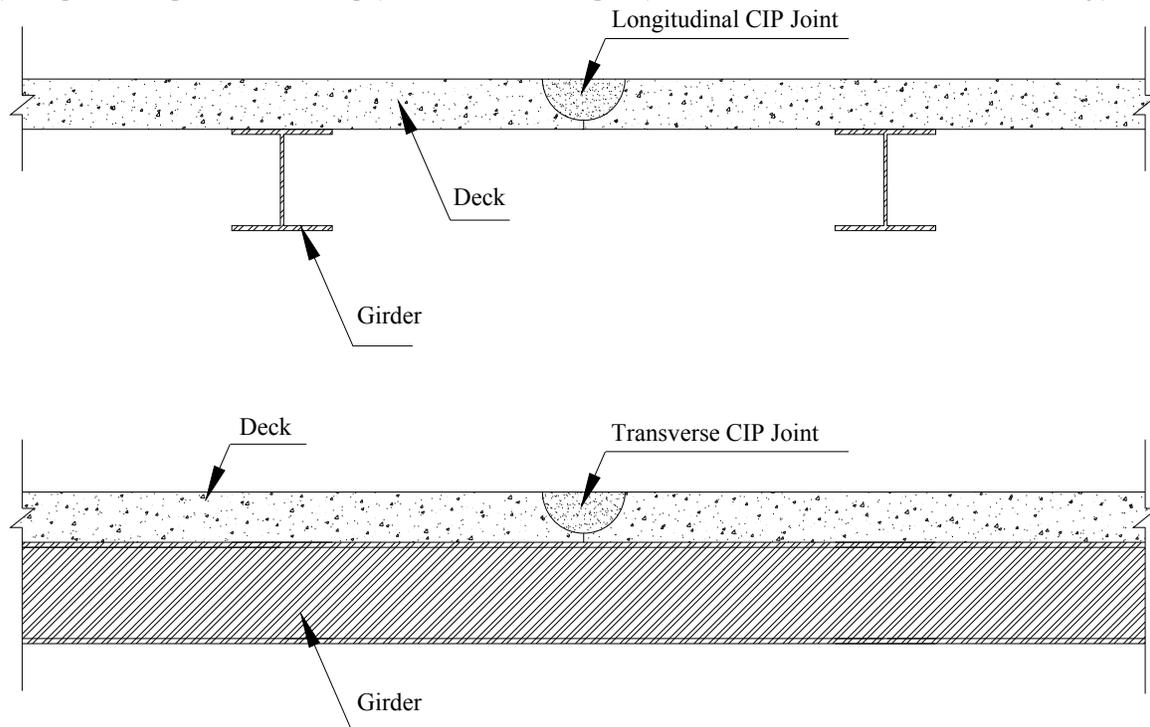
Sketches with Longitudinal and Transverse Joint Examples
